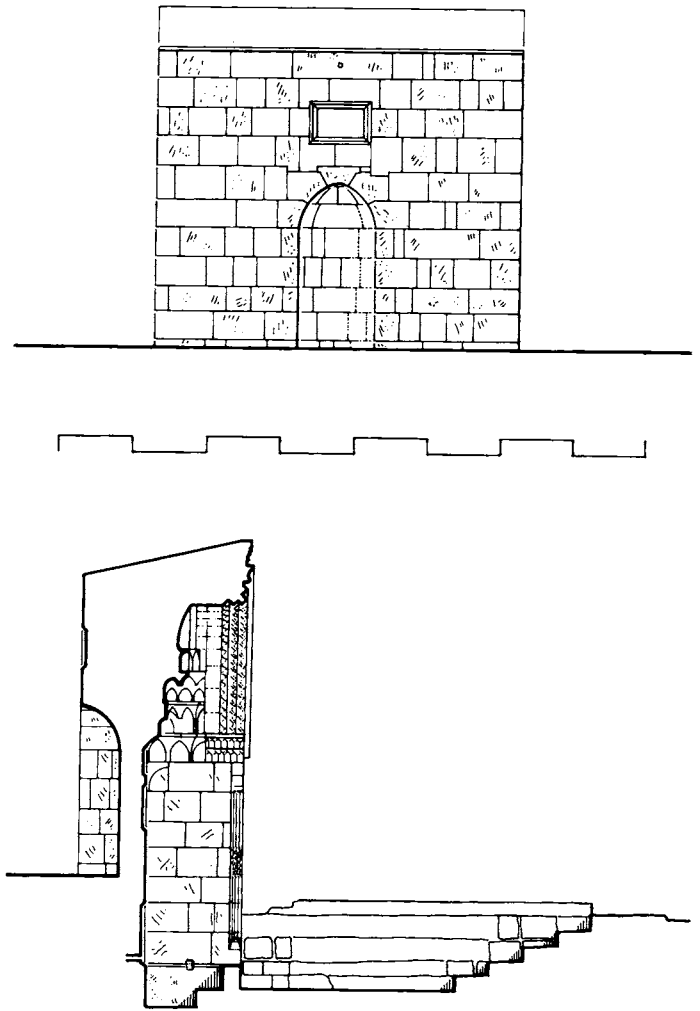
Mihrab Bab al-'Atm, elevation and section.
